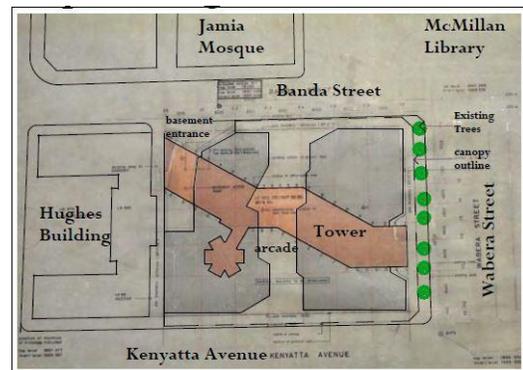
ICEA building site plan. (Source: Architect author, 2016)
